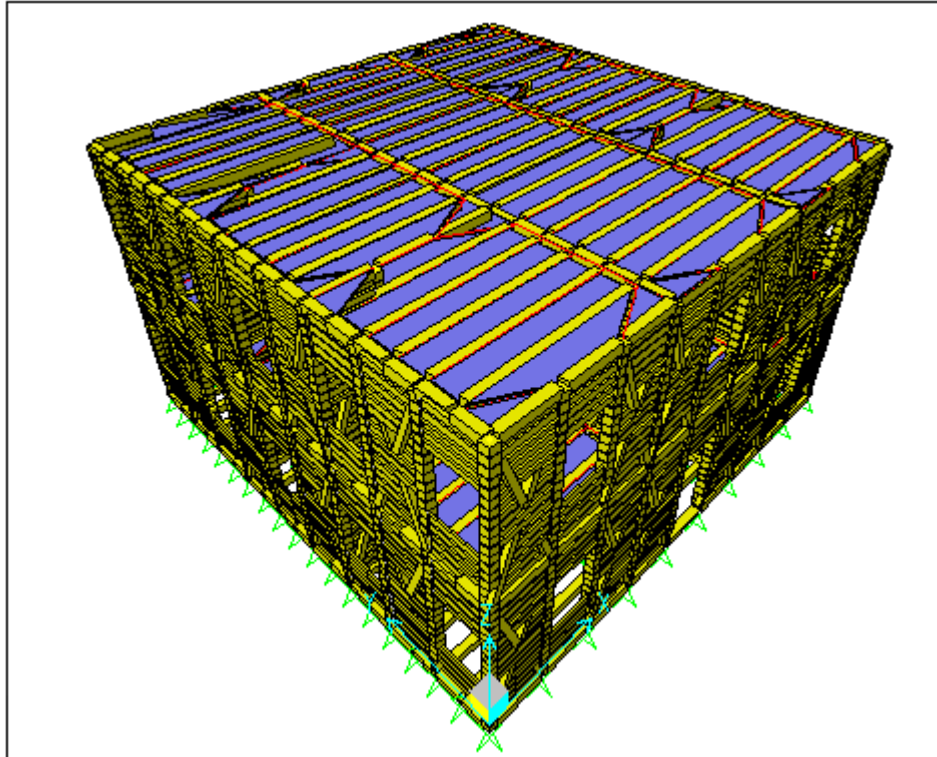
Undeformed Shape of Bagdadi Type Building Without Infill
